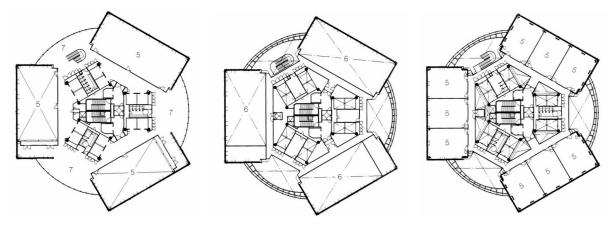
h – Floor plans (from top: -1st, -2nd, -3rd floor)
